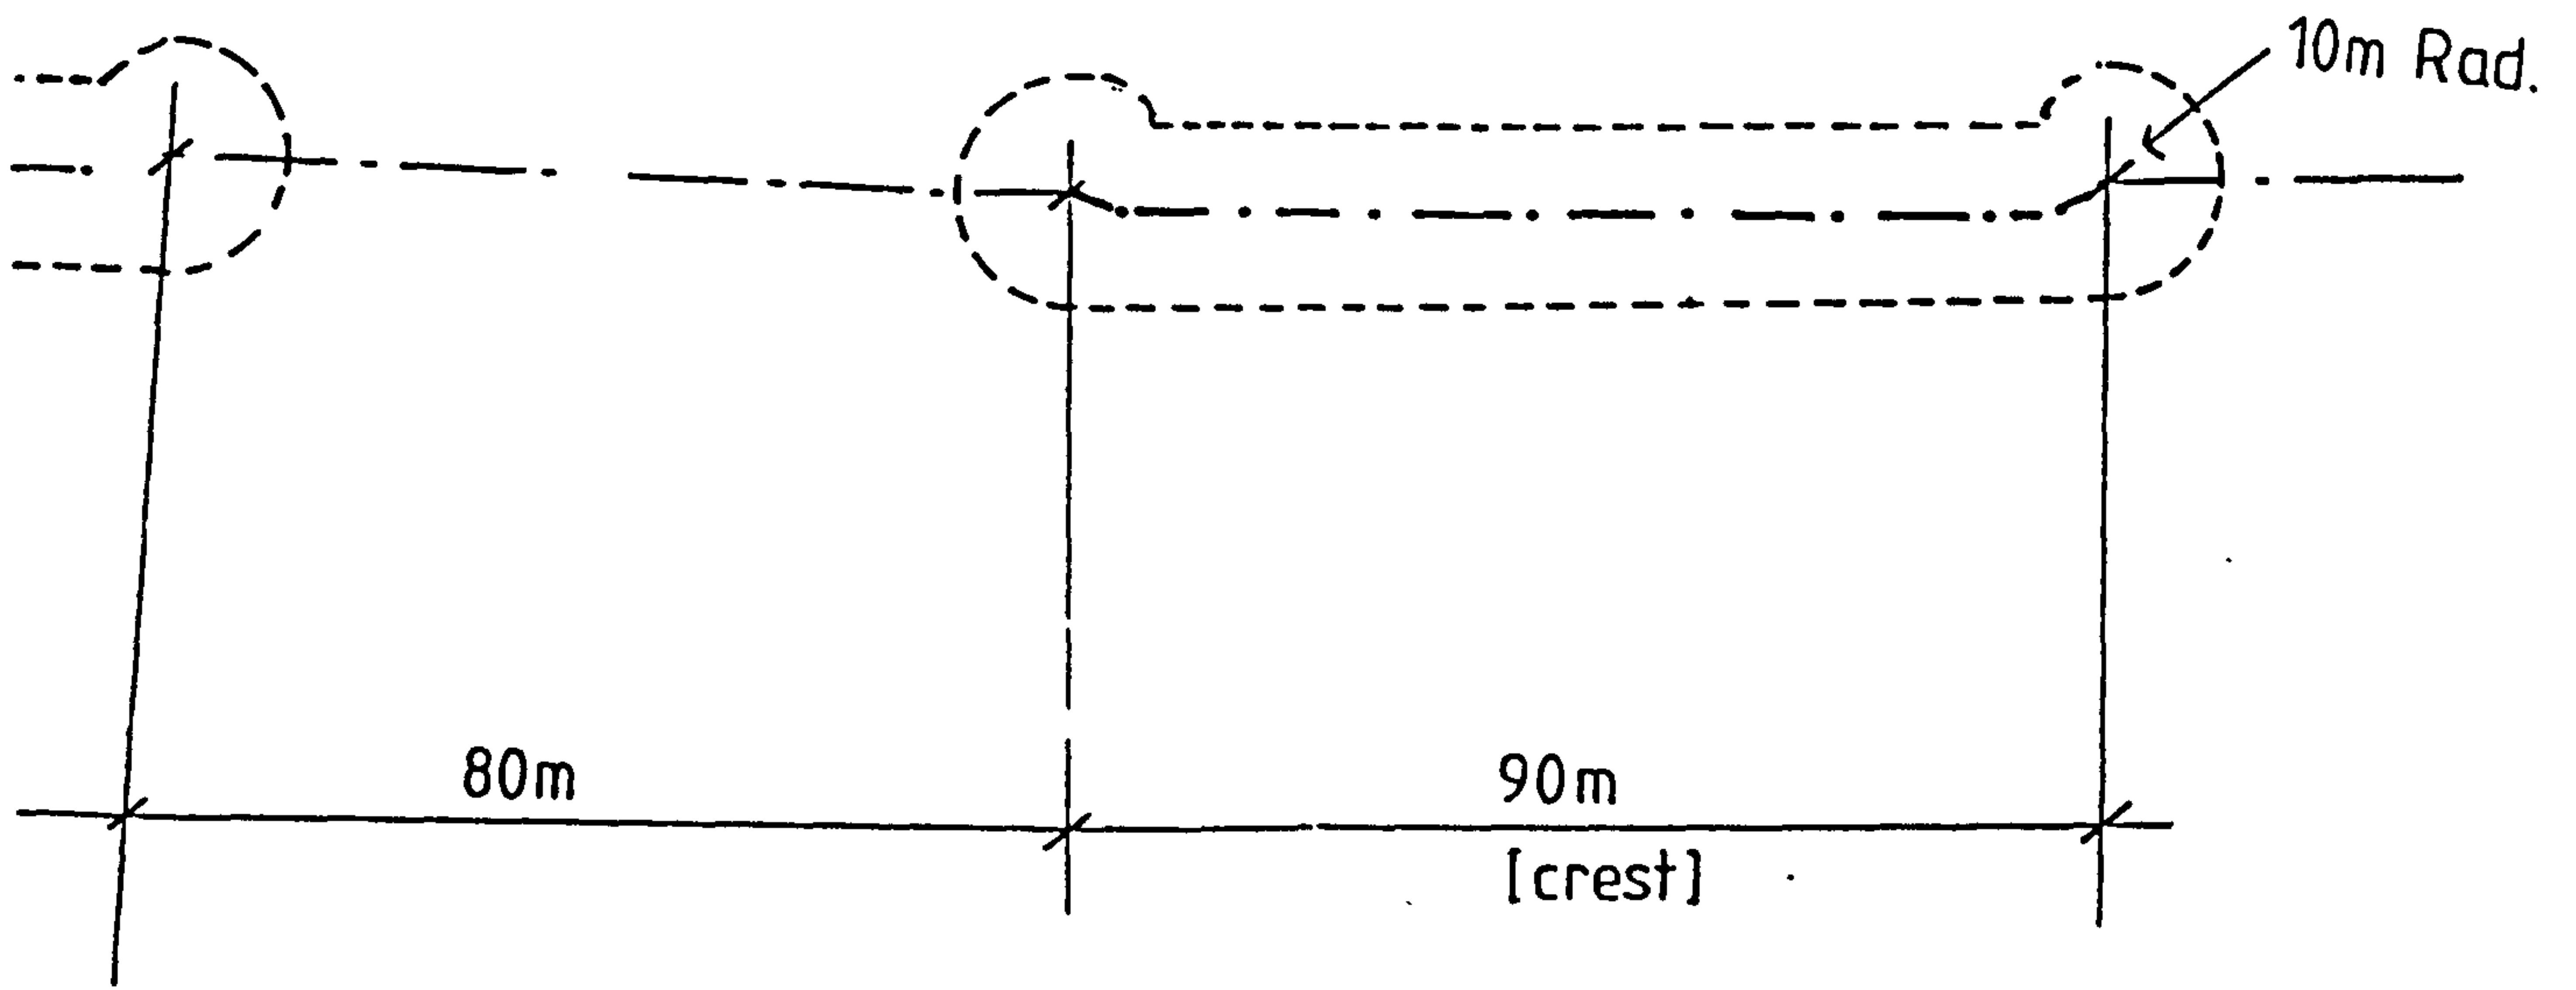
Elmer, West Sussex - rock island breakwater, site plan
